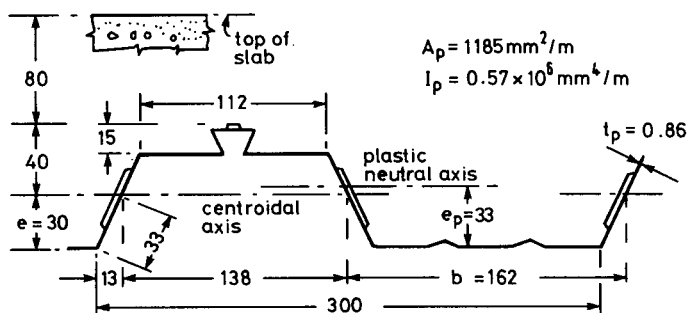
Typical cross-section of CF 70/0.9 profiled steel sheeting.
